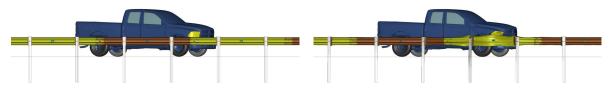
Overhead View of Impact Point for 137.5-ft Long Guardrail System
